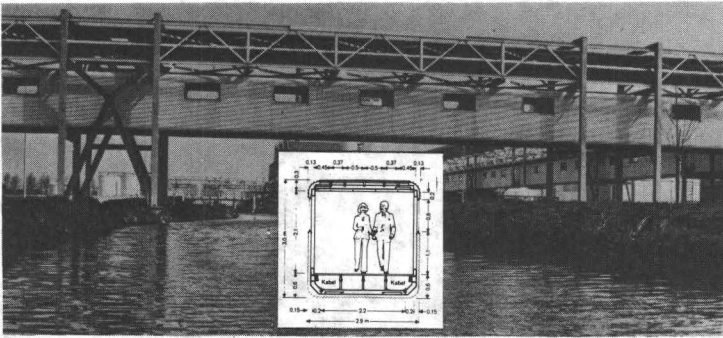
Enclosed footbridge beneath pipe bridge, Zoeterwoude
